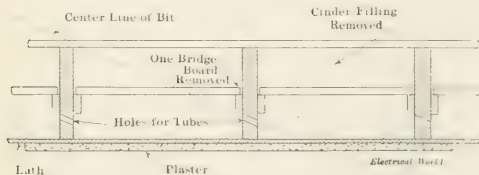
BORING TUBE HOLES THROUGH JOISTS
